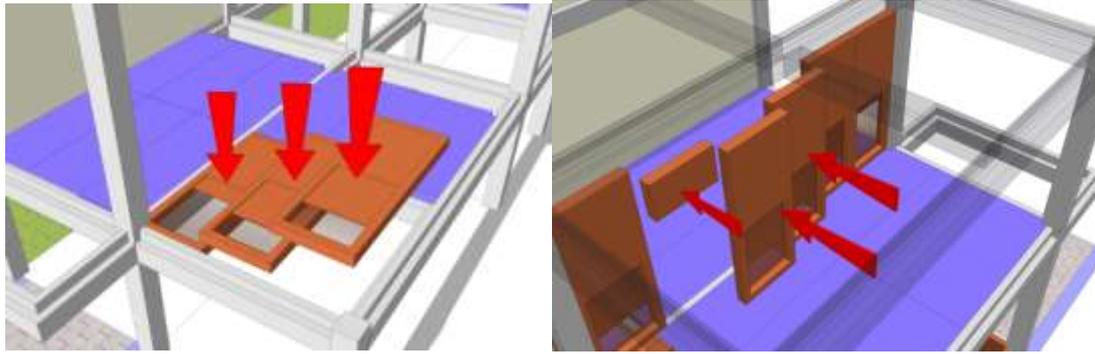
Modular wall panel application for indoor and outdoor walls and modular floor panels that can use different materials such as wood, composite panels or concrete panels.
